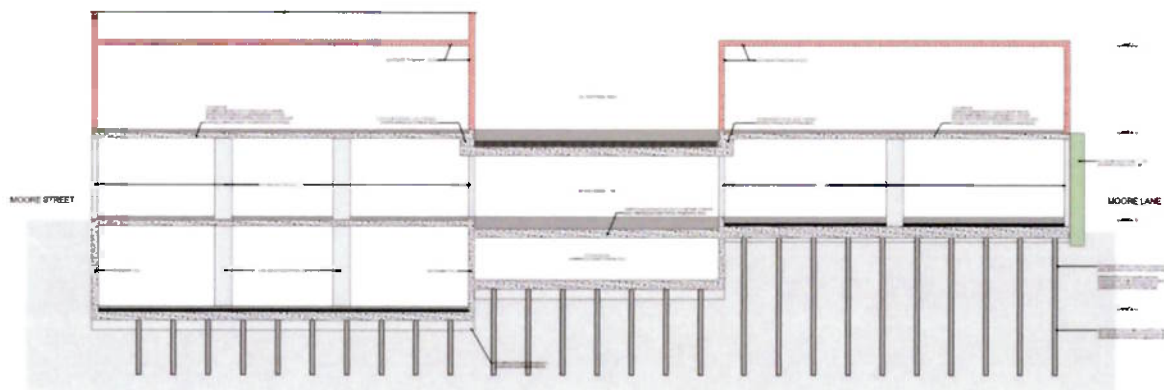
Section Through Site 4 Showing Basement Foundation Strategy and Basement Levels.
